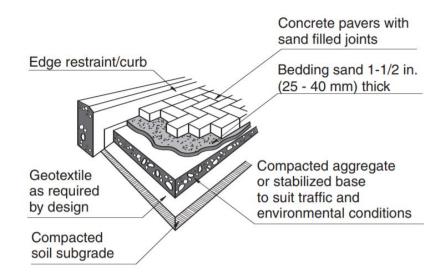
Typical component of Interlocking Concrete pavers system (Mujaj and Smith, 2001).
